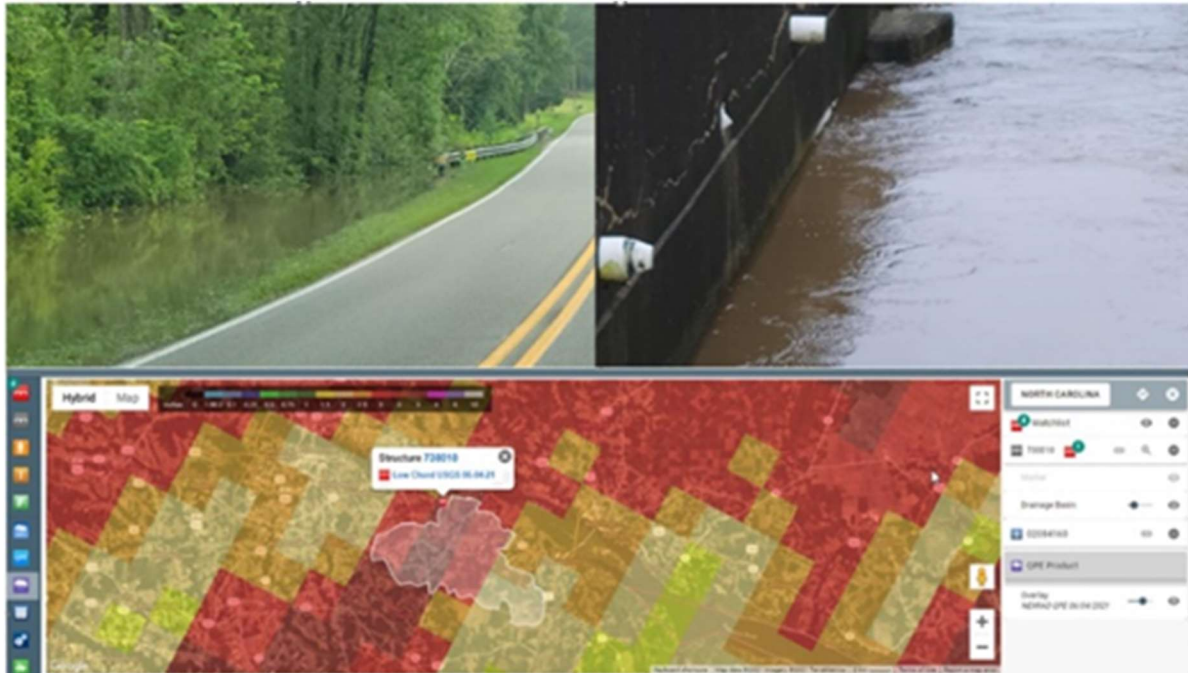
Example of low chord alert and field verification. BridgeWatch links structure elevation thresholds and stream gauge readings statewide monitoring bridge performance and roadway overtopping in real time.
